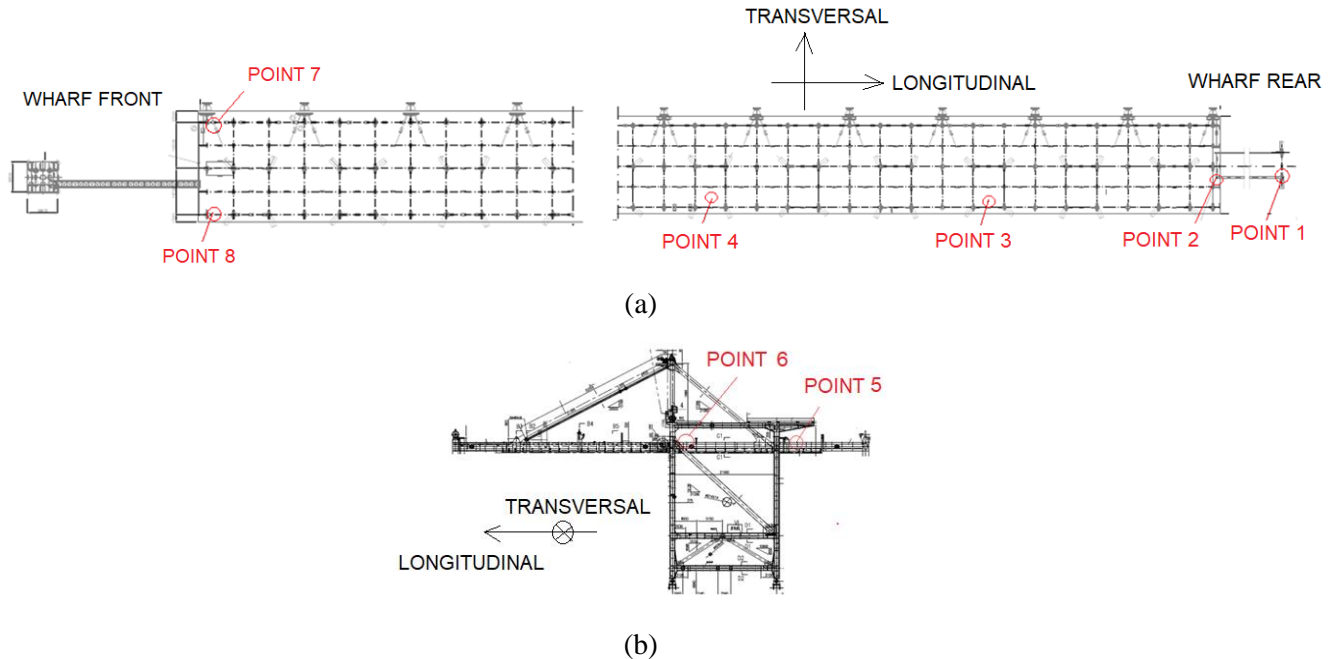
Measurement points: (a) Wharf slab plan view (b) Crane elevation
